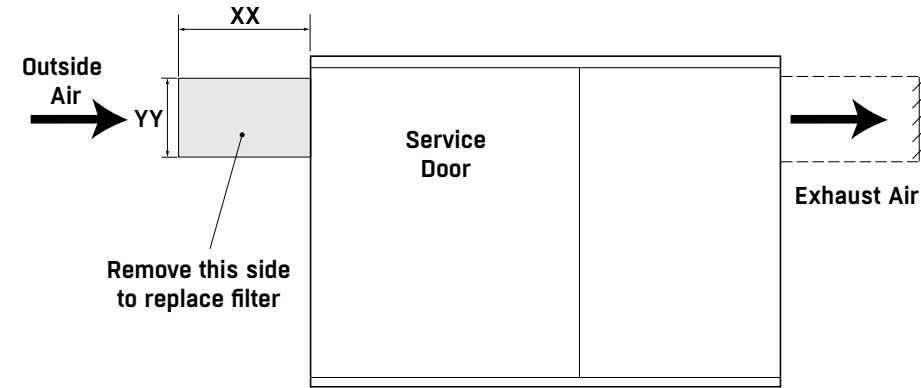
Front view of the FV Pre-conditioner with attached indoor filter assembly.
